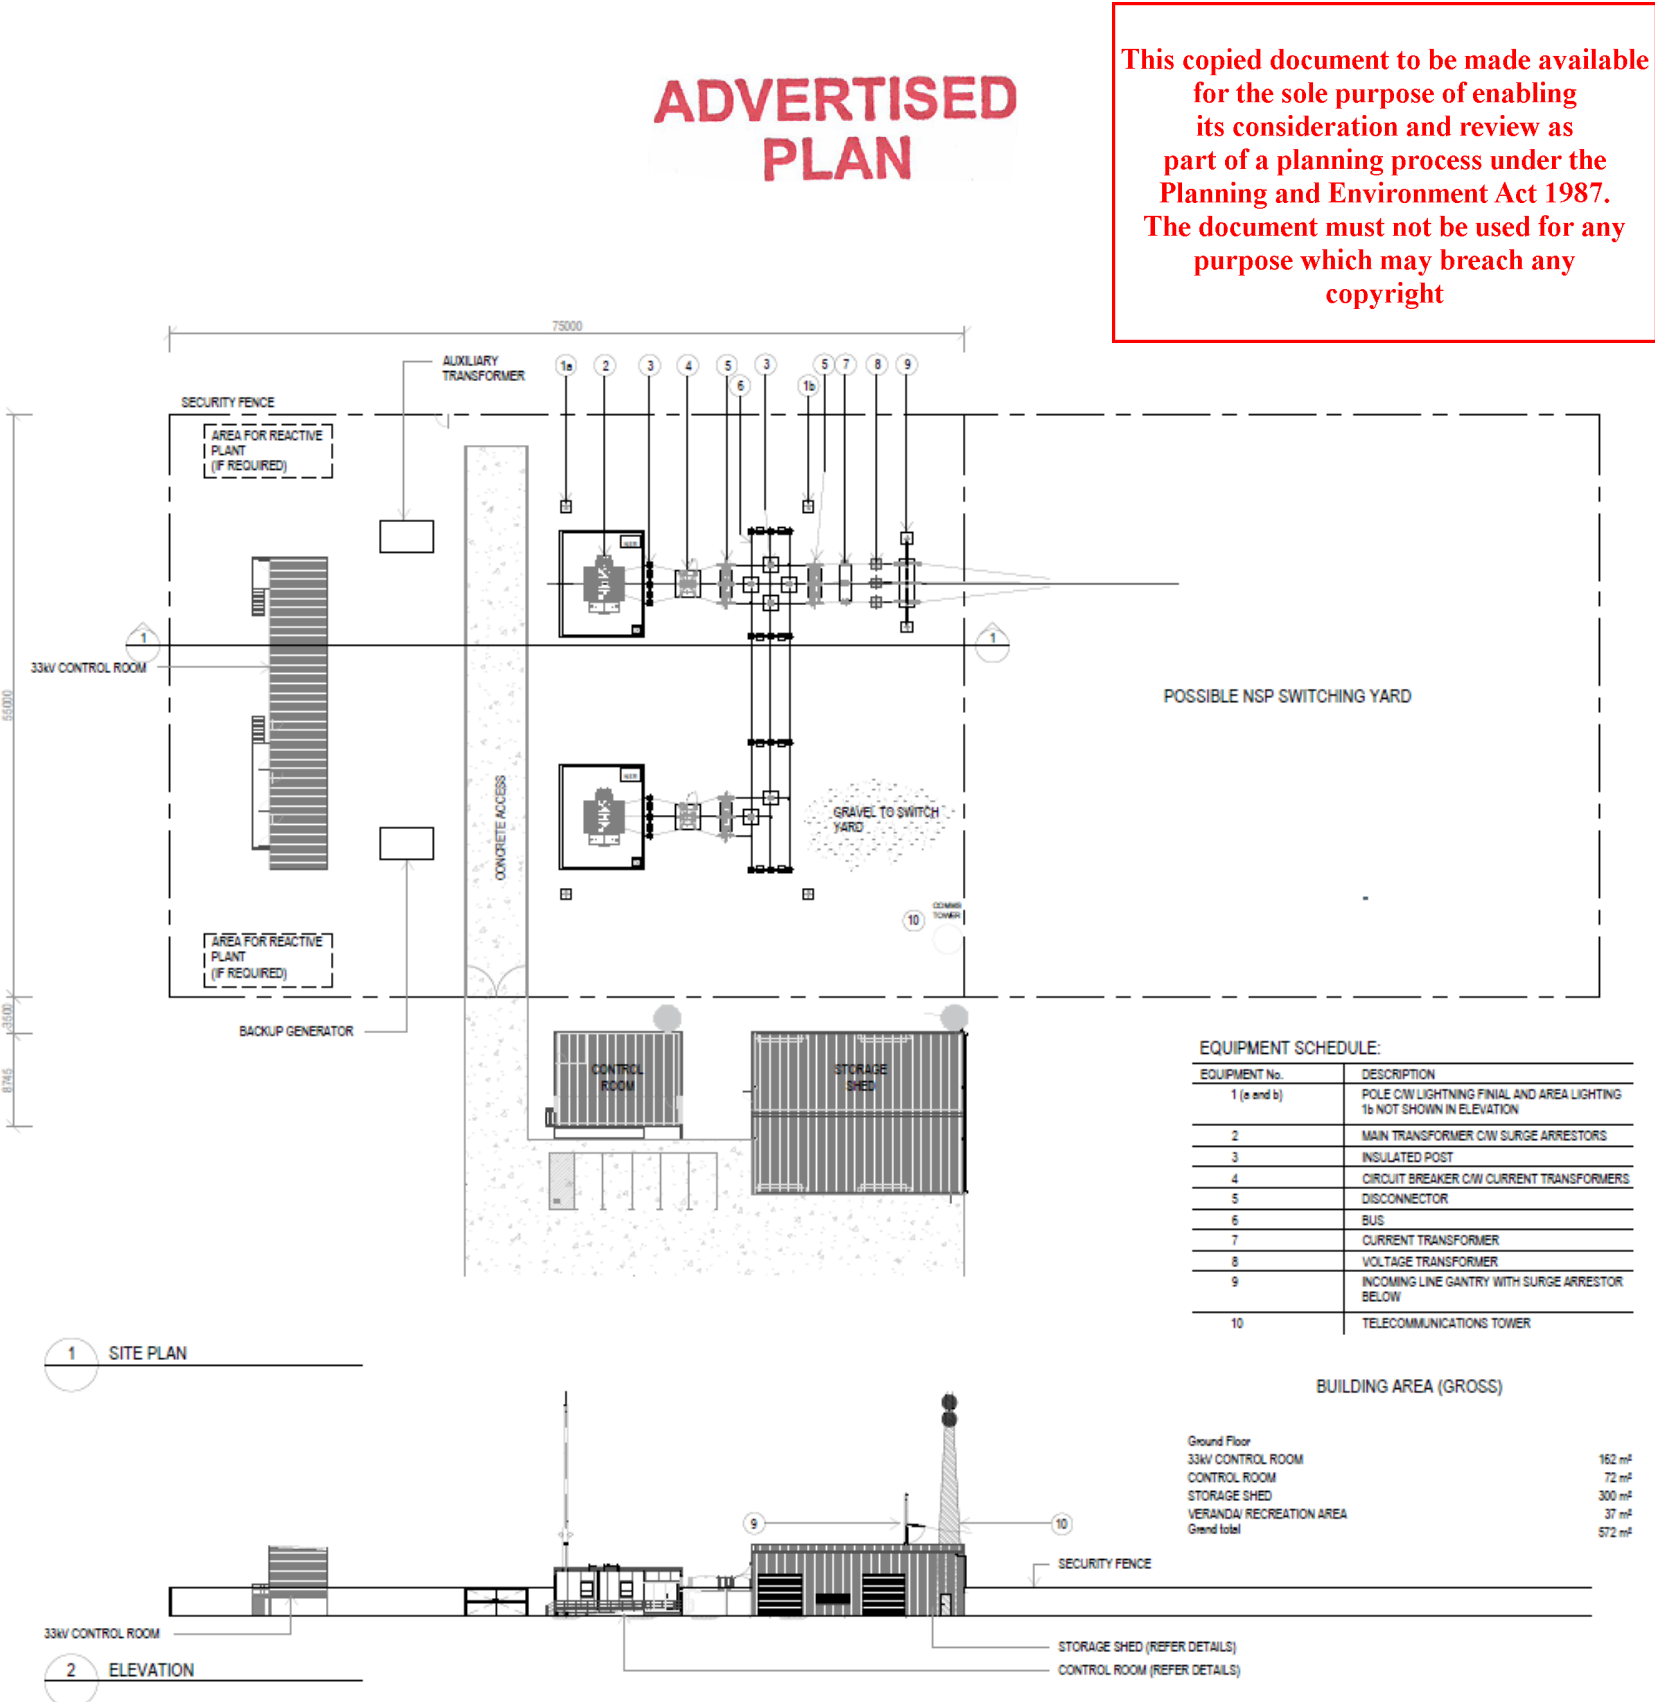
On-site substation general arrangement (Source: RES Dwg No: 03707D4002-01)
